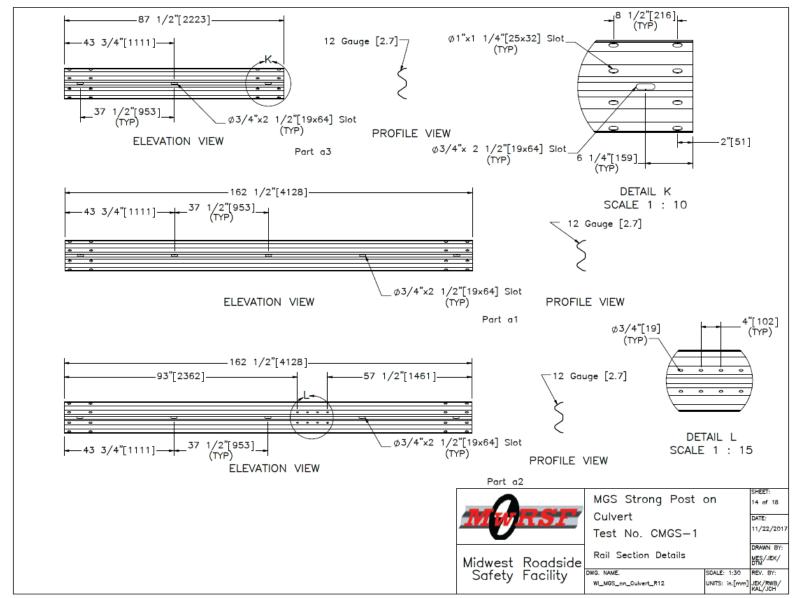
Rail Section Details, Test Nos. CMGS-1 and CMGS-2
